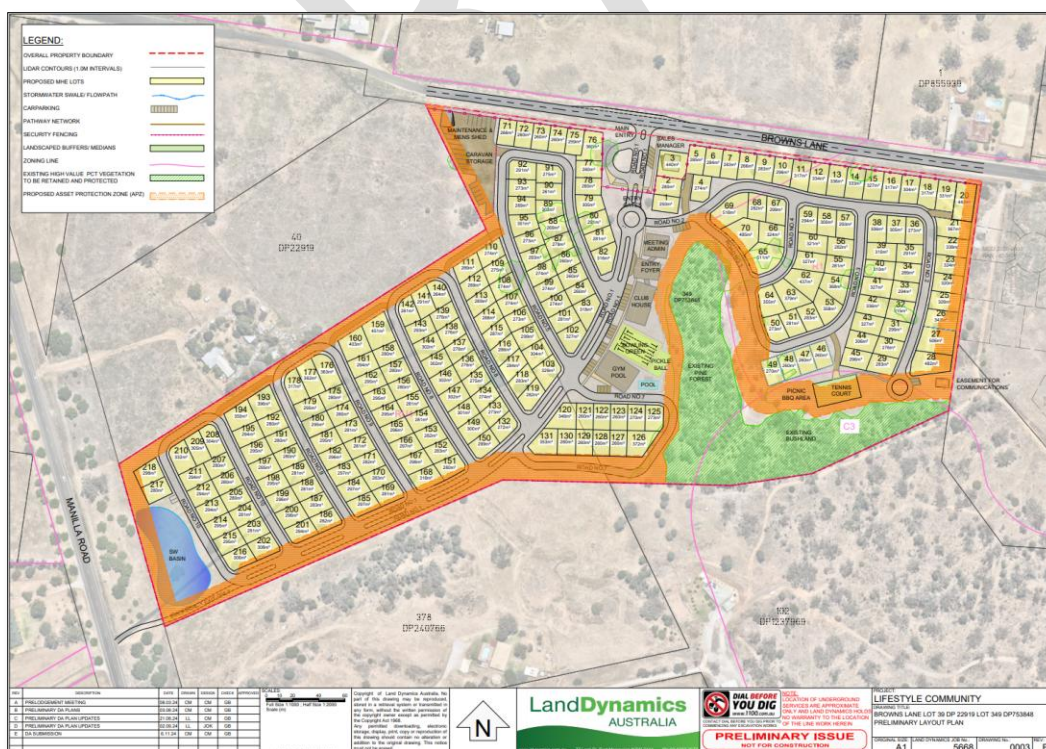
Stamped Approved Overall Site Plan (To be updated upon approval)
